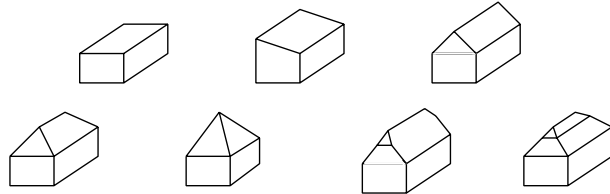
Some basic building types with different roof shapes: flat roof, pent roof (lean-to roof), saddleback roof (gable roof), hip roof, broach roof (pavilion roof), hipped-gable roof, mansard roof (gambrel roof).
